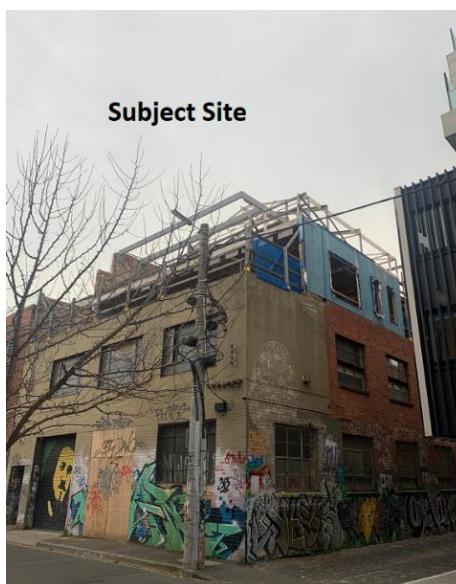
Subject Site as viewed from the south-east along Rose Street, where intersecting the Mechanics Laneway.
